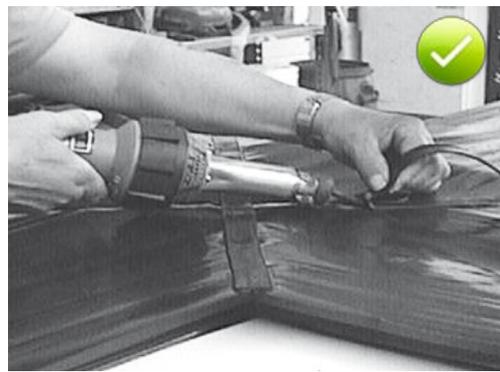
Reinforcing the weld during prefabrication of the waterbar by using a hot air gun to weld on a reinforcing strip of the same material
